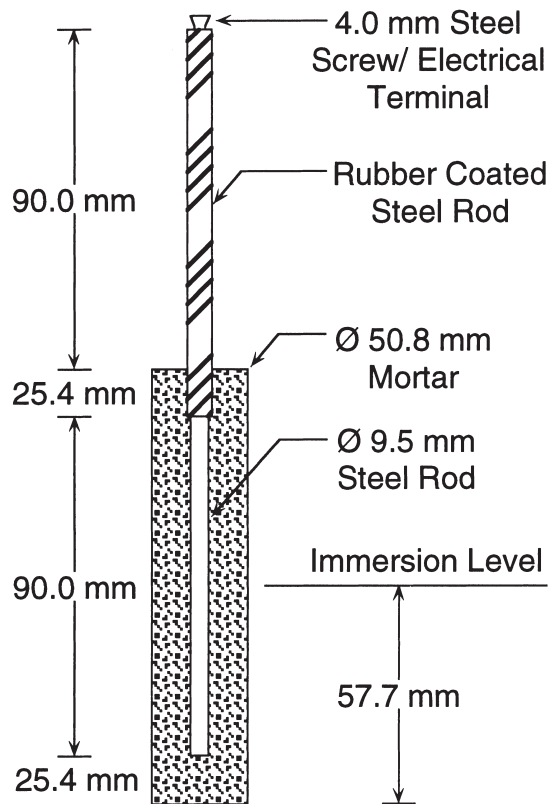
Detailed drawing of cylindrical mortar specimens.
